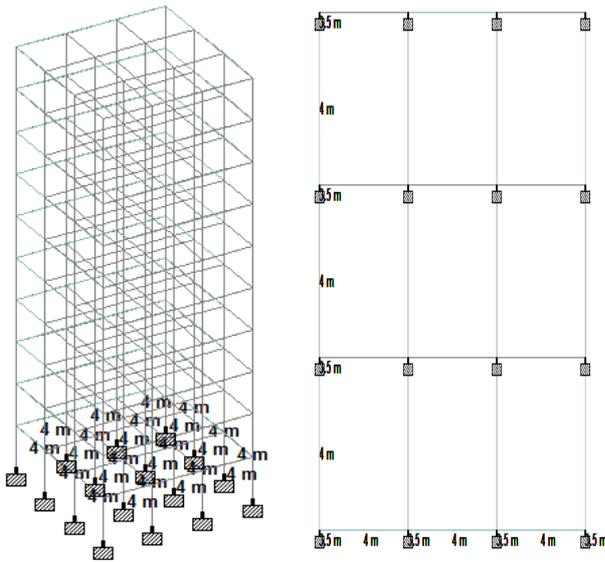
3-D view of RC building frame Figure 6: Plan of the building
